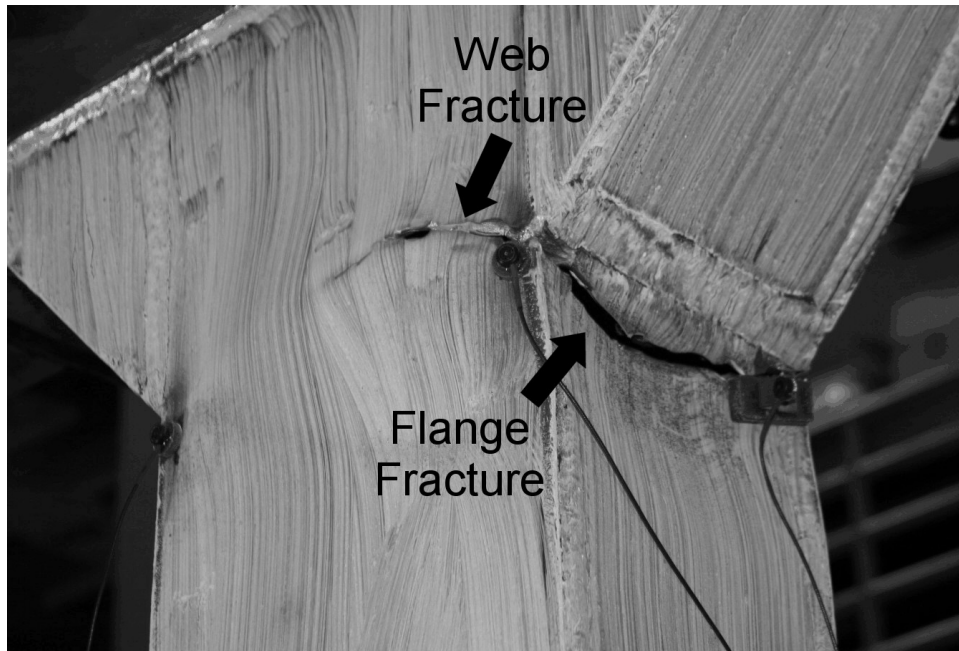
Web and Flange Fracture at Top of Specimen X2L3.0 During Cycle 2 of Sequence 8
